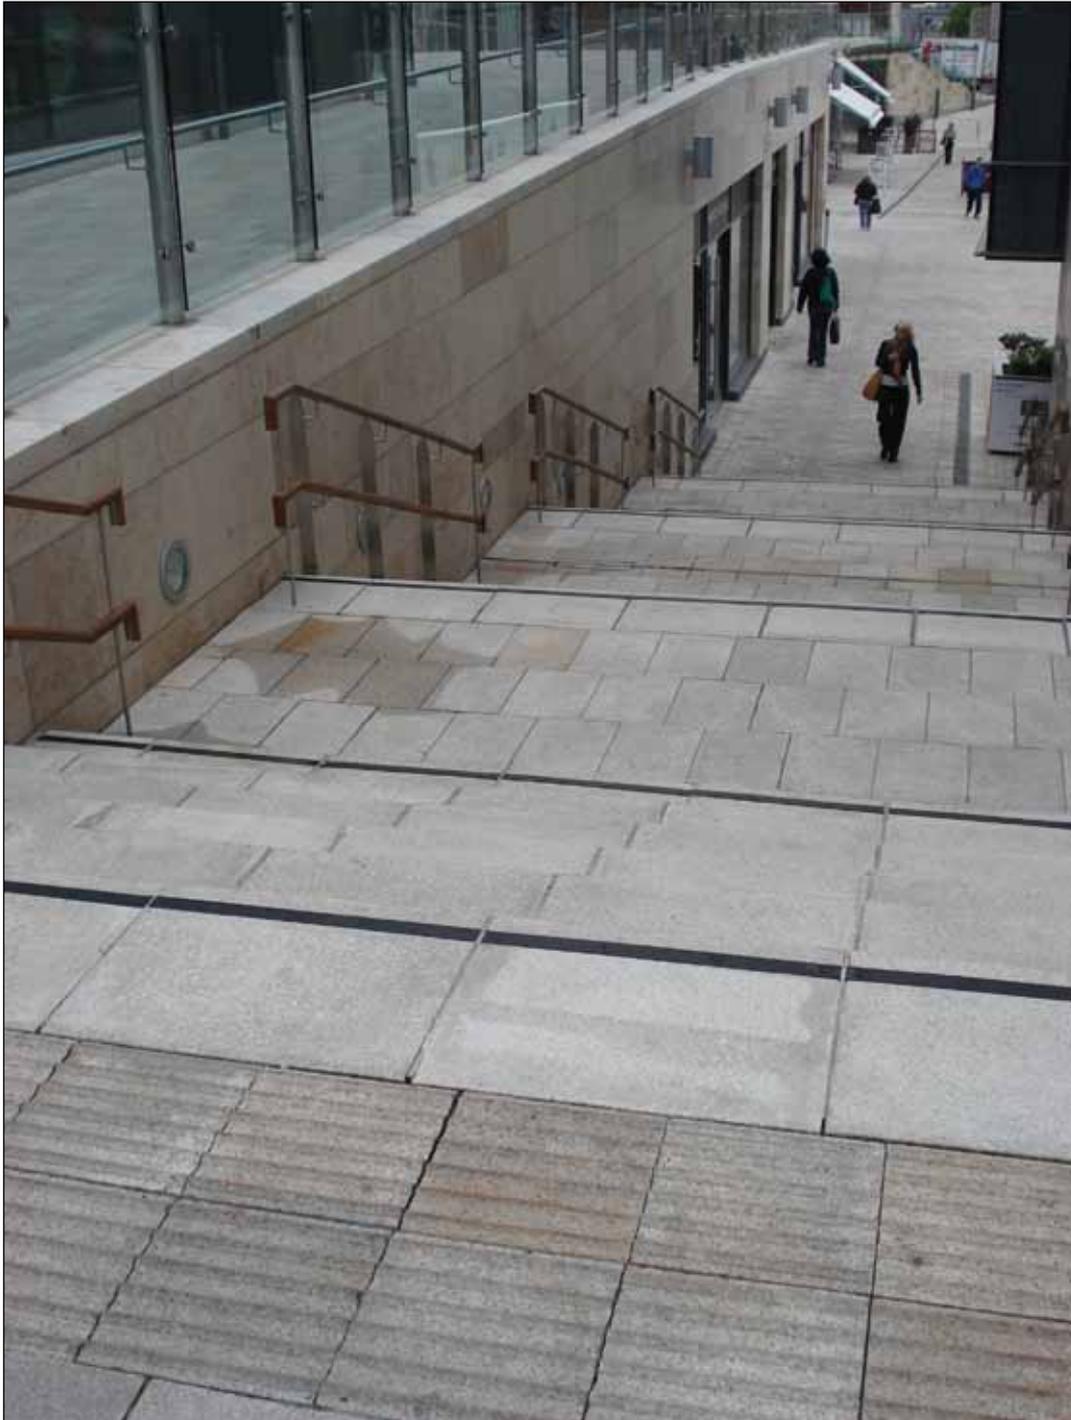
Example of exterior steps, corduroy hazard warning strips, top and bottom steps with contrasting colour strip, handrails plus landings. Note gap between handrails on each landing. The handrails should continue to help those needing additional support. Note also the lack of a permanent contrasting strip to the nosings of the steps between the top and bottom step plus there should be a tactile warning strip at the bottom of the steps.
